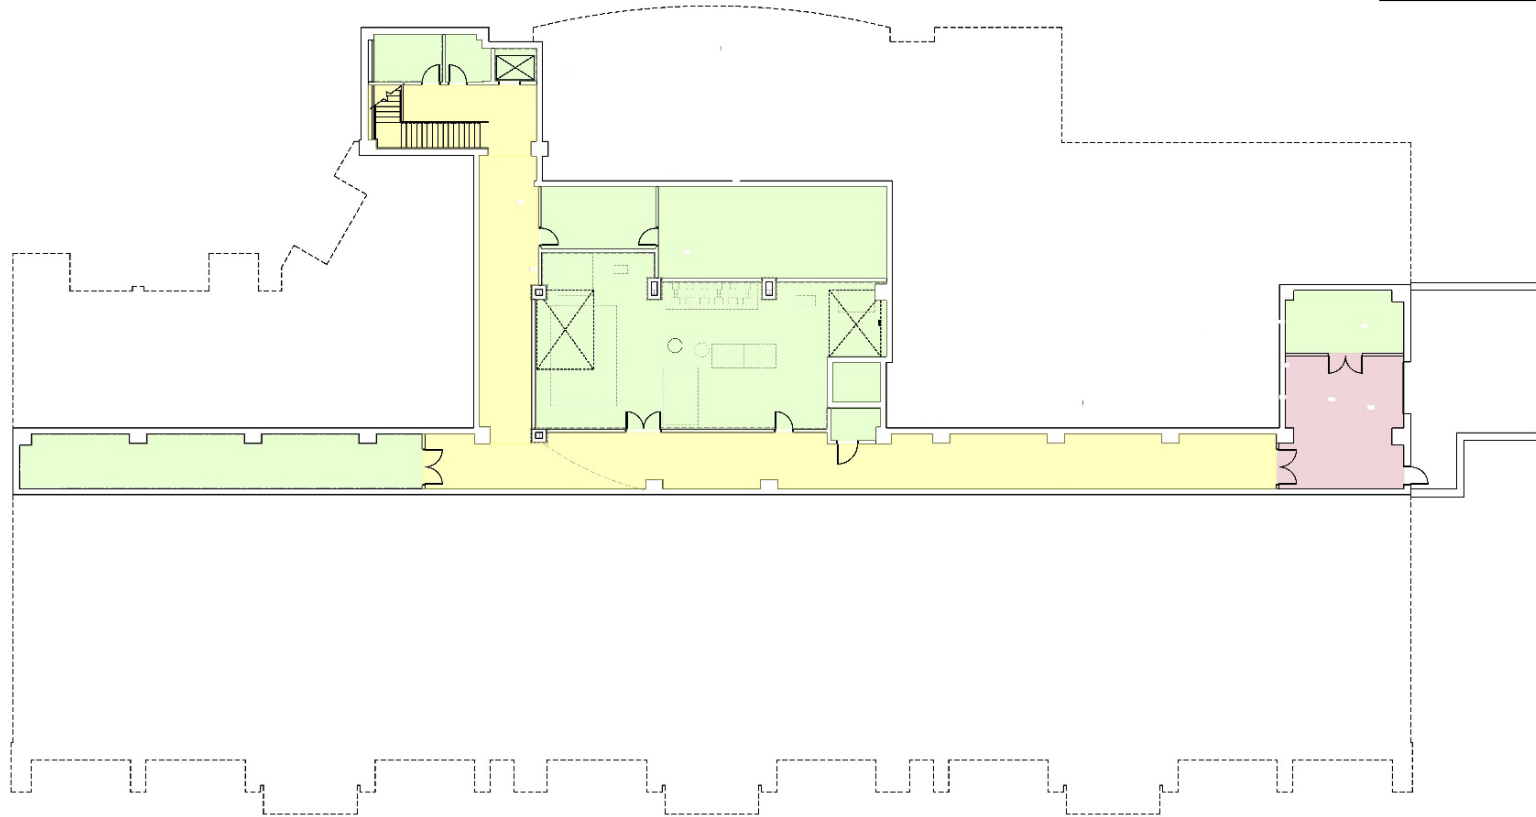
Passenger Terminal Building Upper Level
